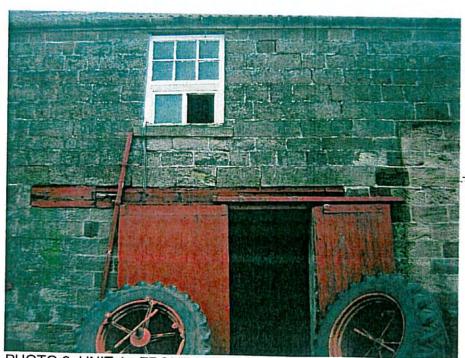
UNIT 1 - FRONT ELEVATION (3.01)
